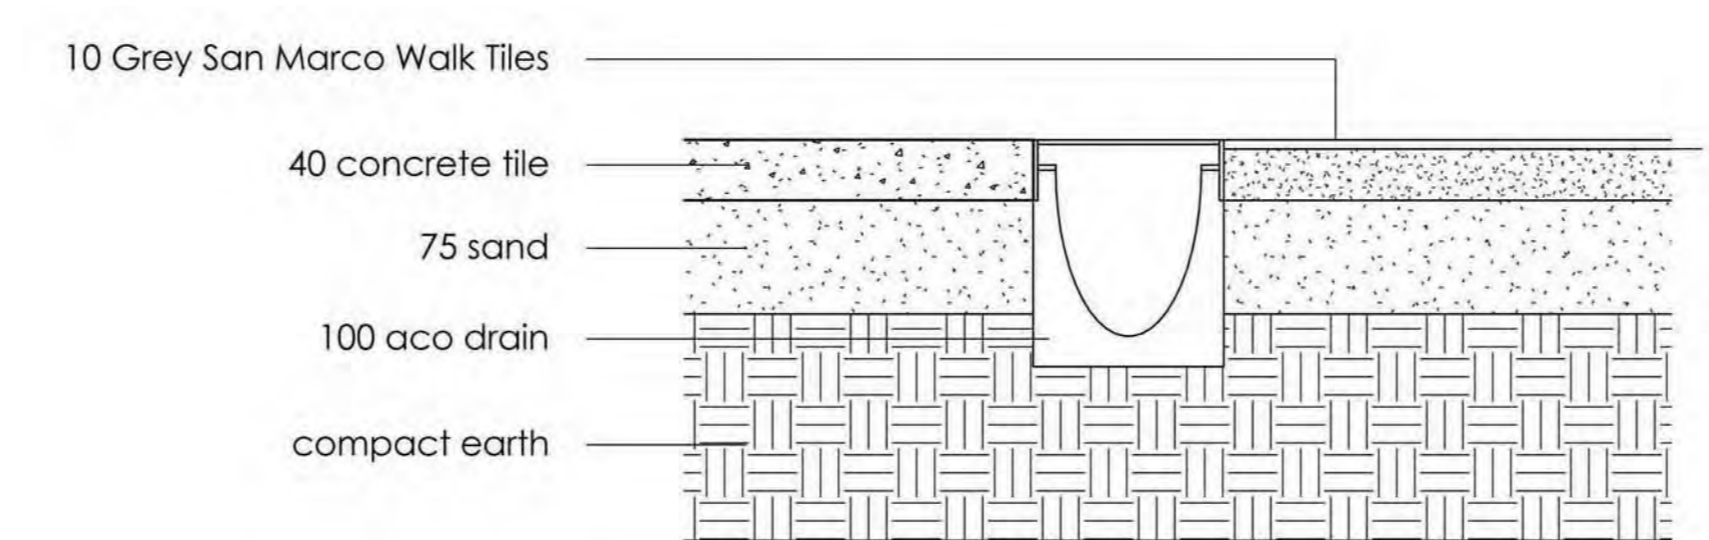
Detail of threshold created through drain, between concrete tile and San Marco tile surfaces
